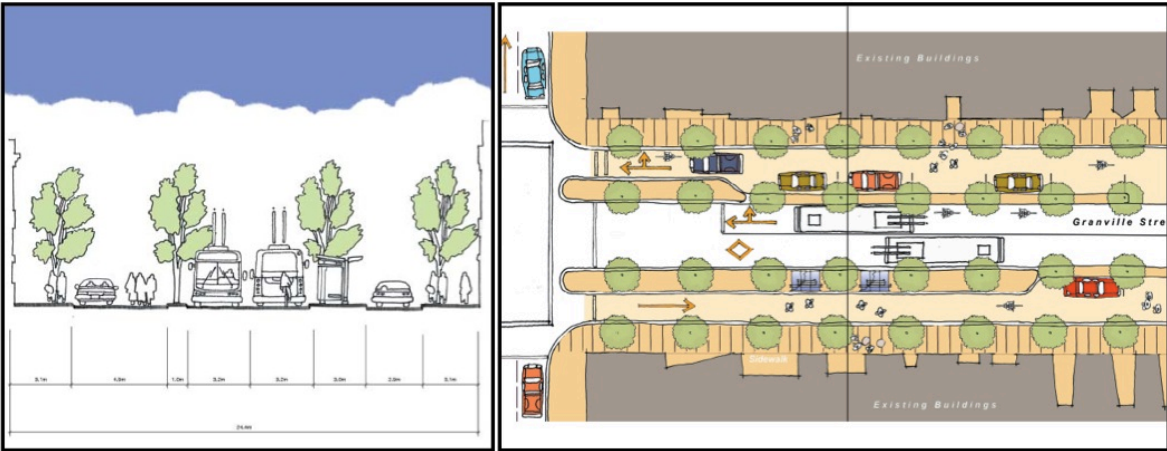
Two Sided Flex Concept - Cross section and typical block plan views
